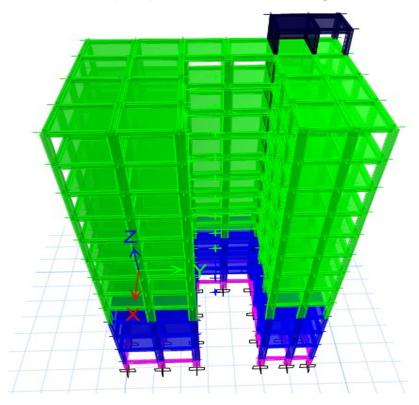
3D view of (G+12) storied commercial building for Plan 05
